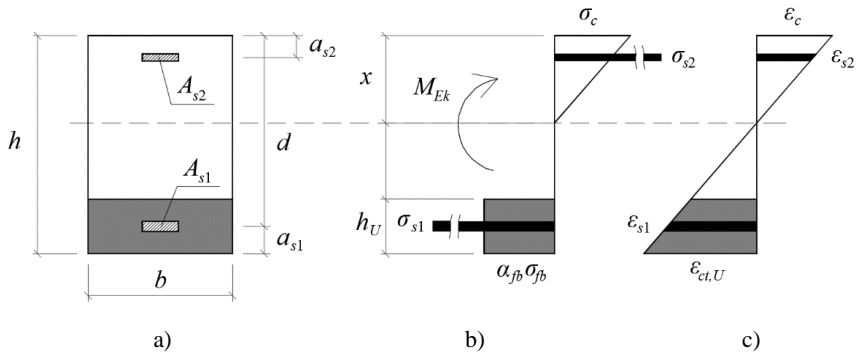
Reinforced concrete composite member cracking moment calculation scheme when the first cracks open in the layer of ordinary concrete: a) cross-section of reinforced concrete composite member, b) stress in uncracked section, c) strains in uncracked section
